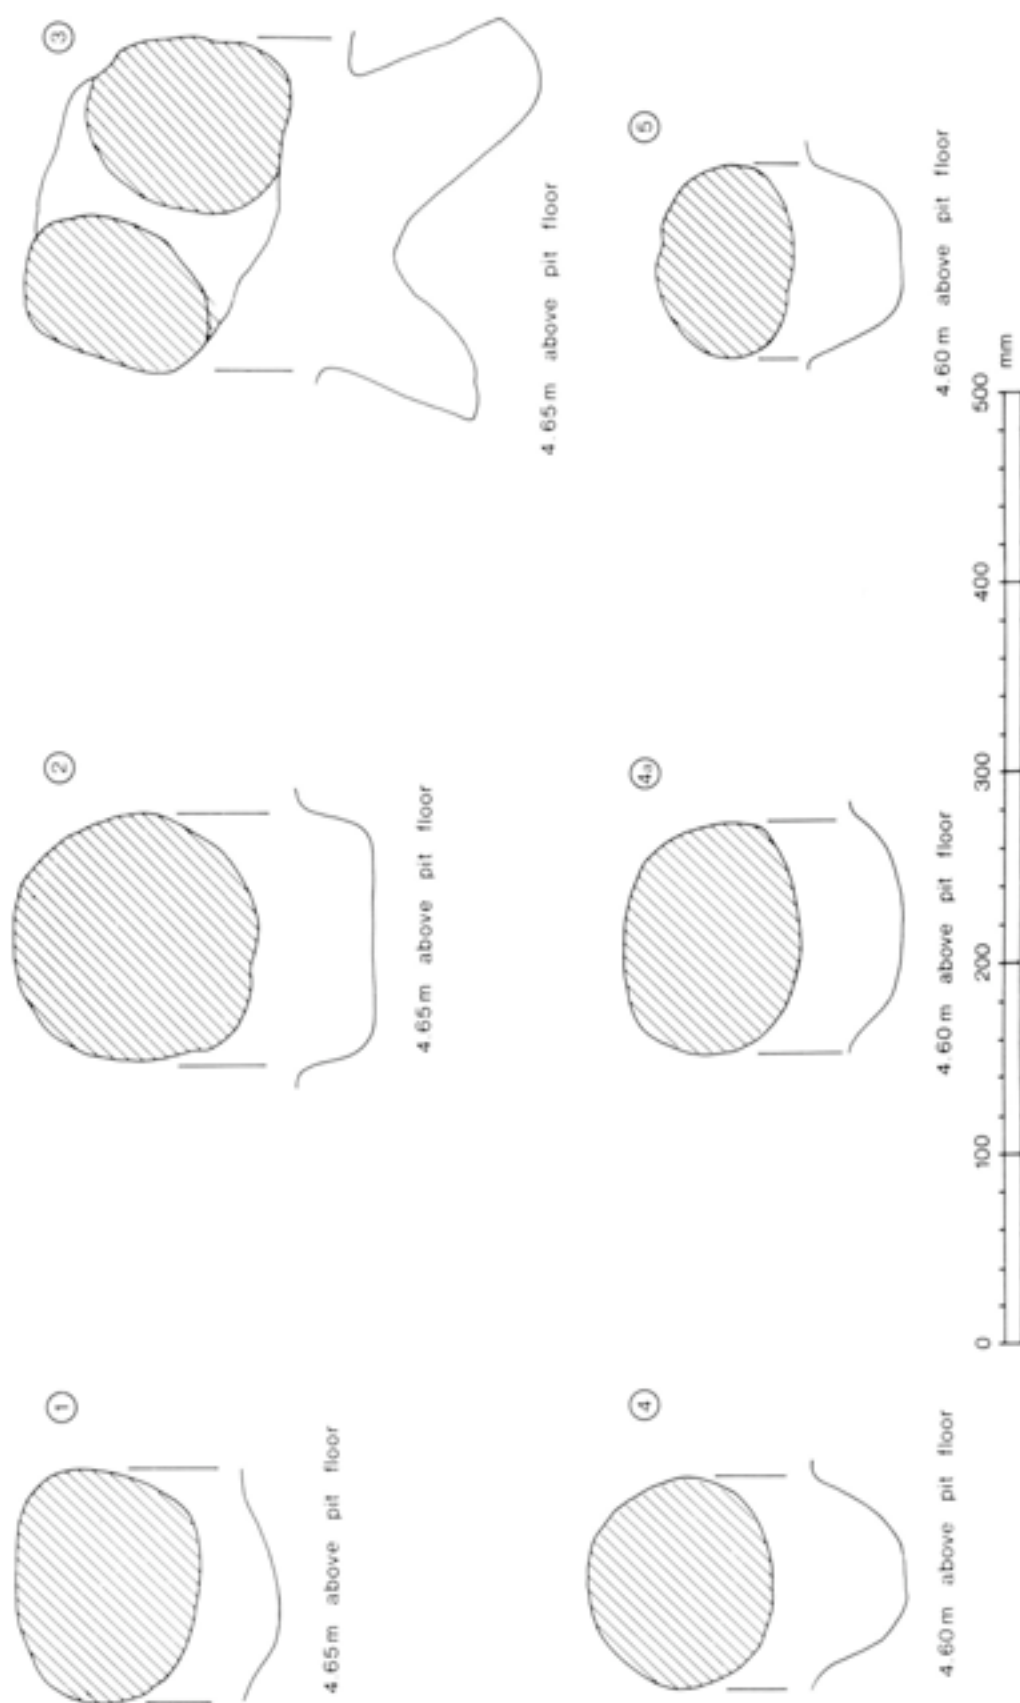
1971 Shaft detail plans and sections of timber sockets in the shaft wall
